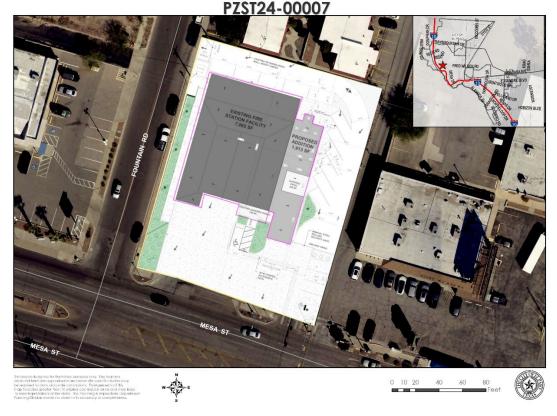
Figure A. Detailed Site Development Plan Superimposed on Aerial Imagery.
